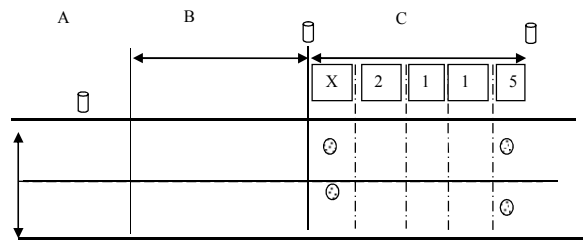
Typical survey site layout; ATC denotes automatic traffic counter; -PD denotes pavement distress; Surveynote that A/W denotes pavement distress area
